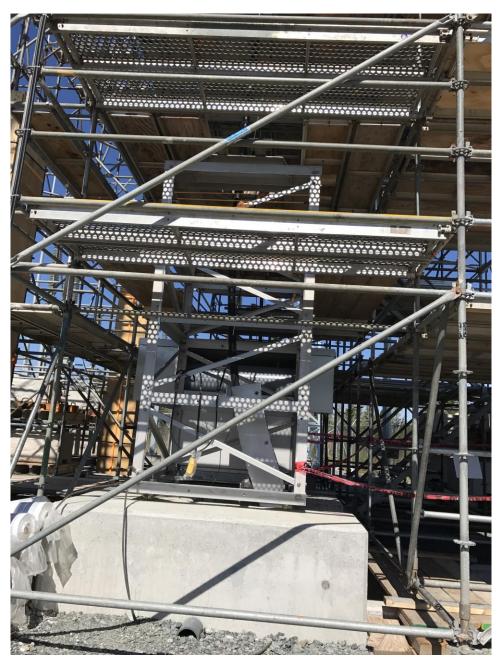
Scaffolding erected for land cables termination installation at the transition compound.
